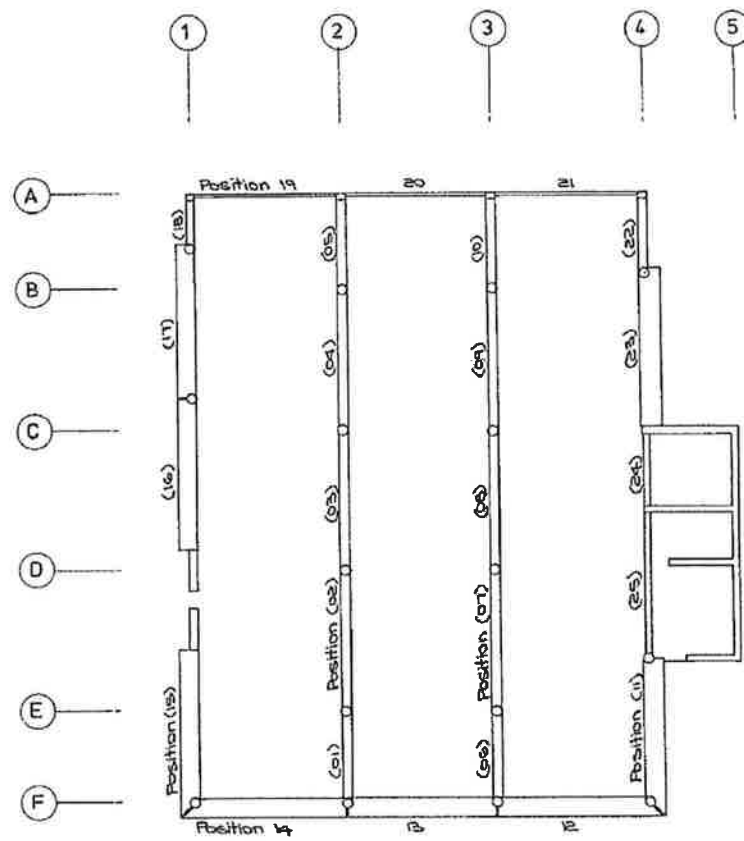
Precast beam location plan (Extract from Drawing S 18)
